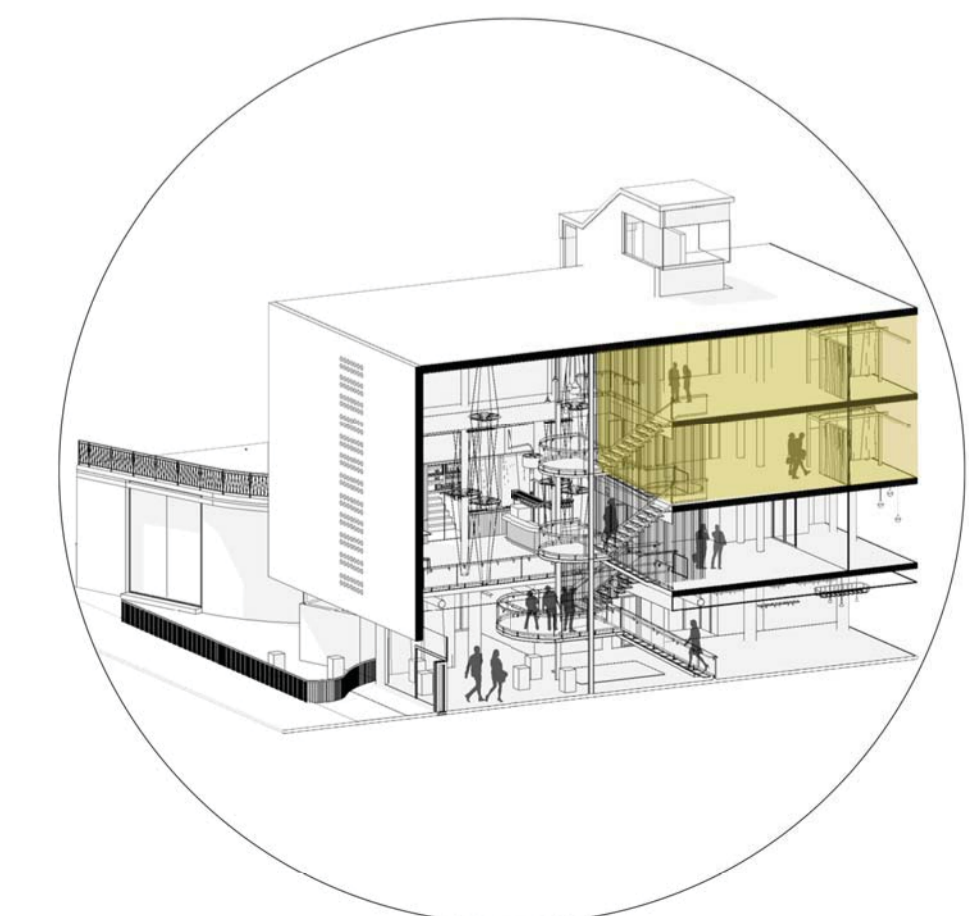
Diagram showing the location of the formal workspace environment on the first and second floor of the Meat Board building.
